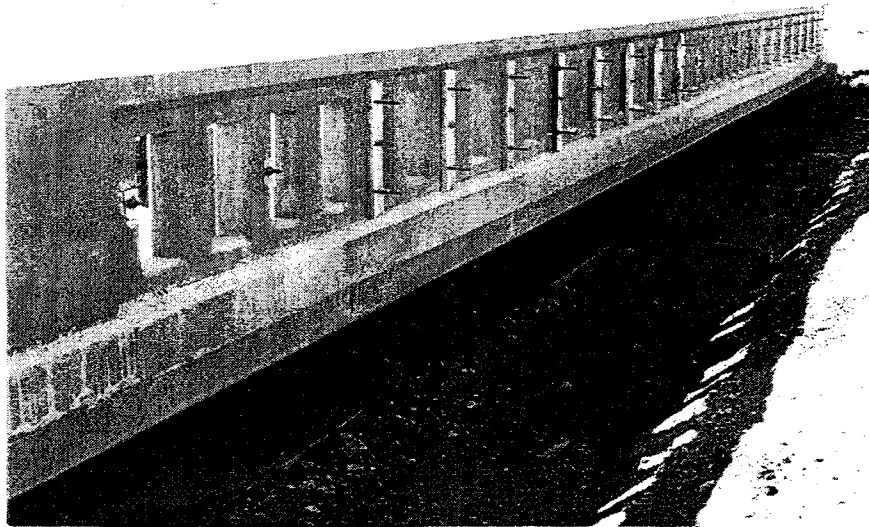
W-beam retrofit for concrete baluster bridge railing used for test 472070-1.
